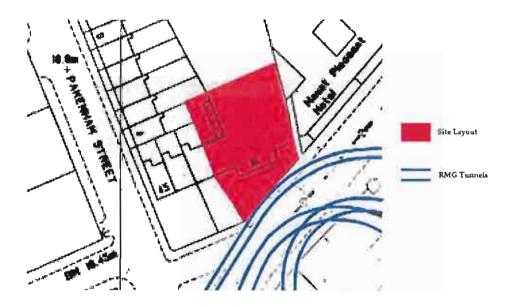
Site Layout of 51 Calthorpe Street showing the location of the RMG Tunnels
